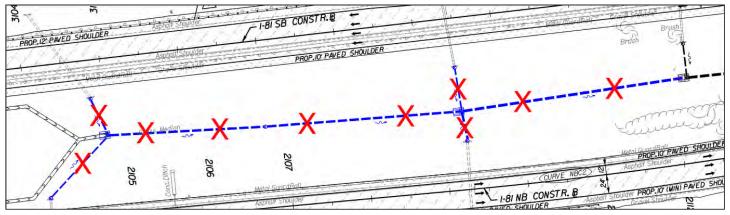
Proposed Storm Sewer Elimination
